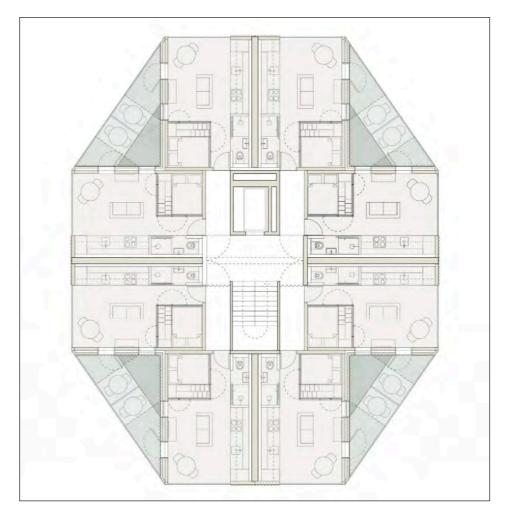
Minimax Tower: Floor Plan highlights the intelligent spatial design of the private spaces, as well as shared balconies and terraces.
